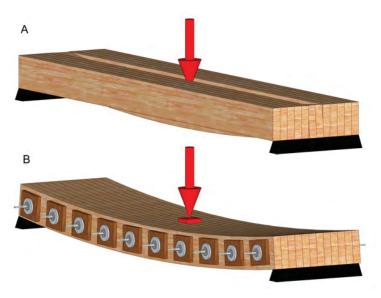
Timber deck and stress laminated timber deck, (Ekholm (2013))
